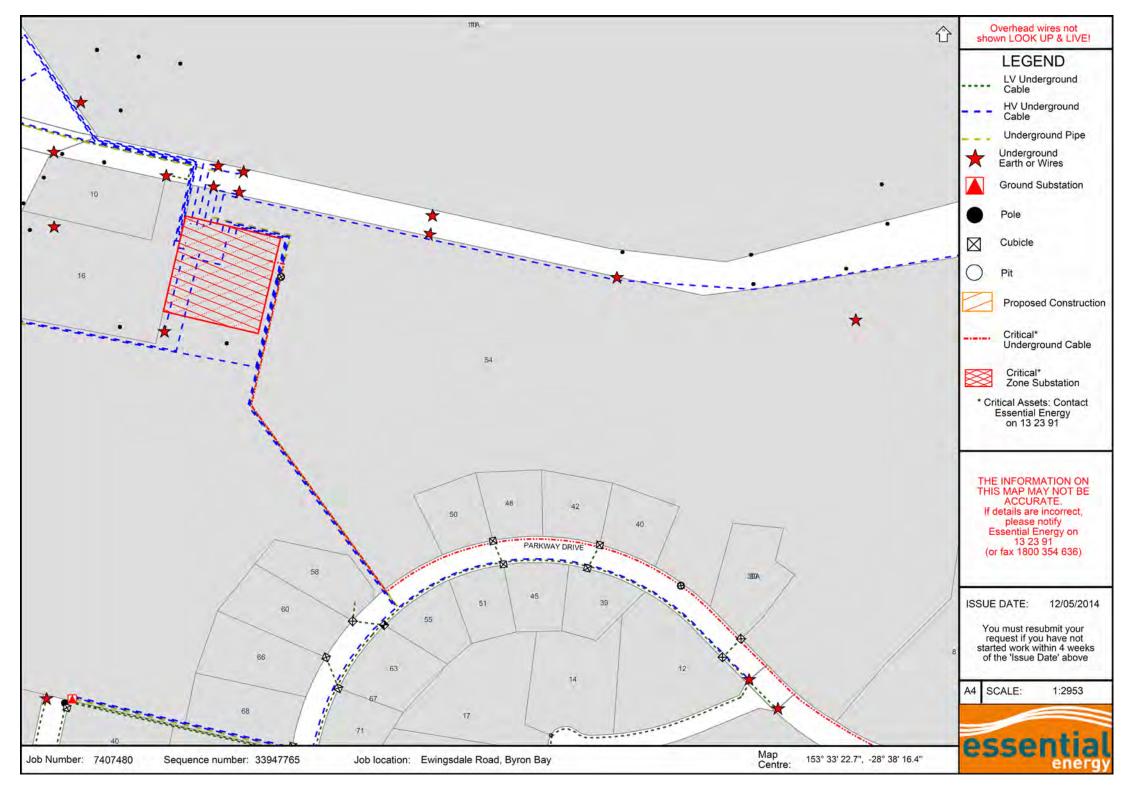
Location of electrical Evingsdale Road Zone Substation and relevant cable network
